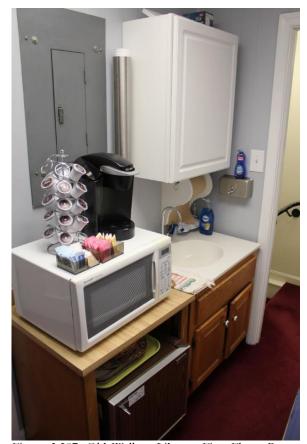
, Old Wallace Library, First Floor, Room 108, view of kitchenette at east wall.
